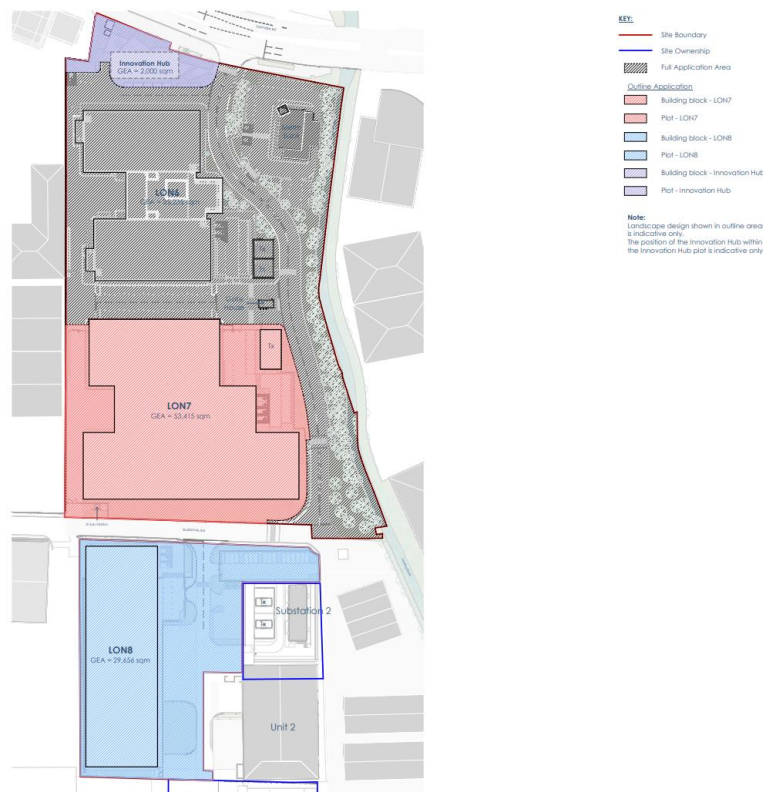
Parameter Site Plan - Plots/Blocks (Studio NWA, 2025)
